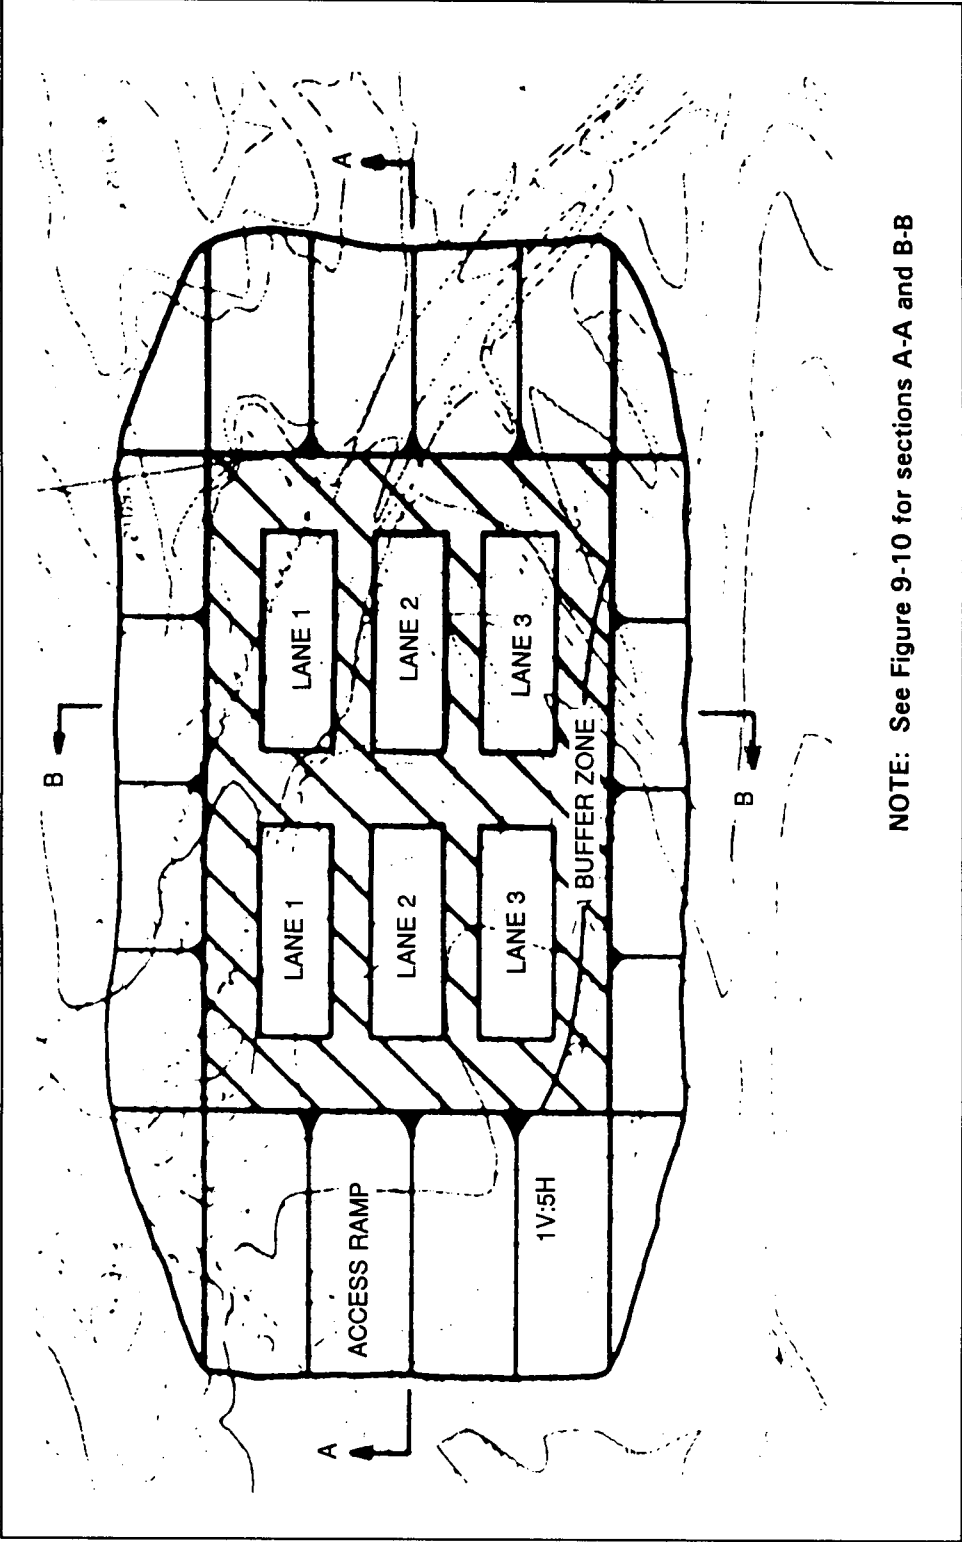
Seven Oaks Dam, plan view of the test fill
